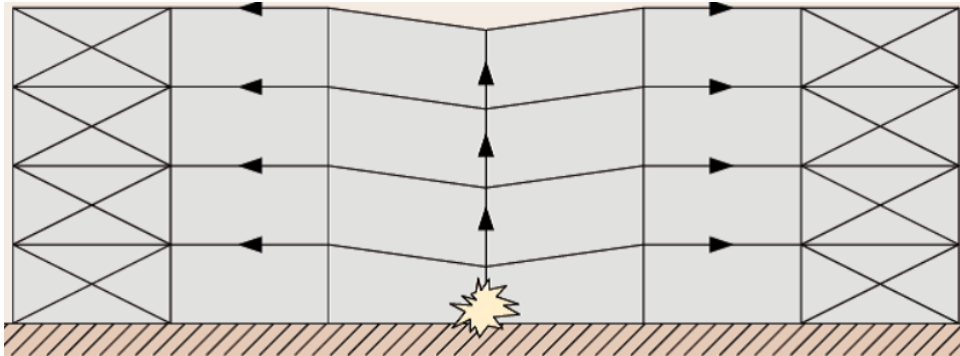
Centre vertical ties redistributing load to the top floors and outward (Steel Construction Info, 2012)
